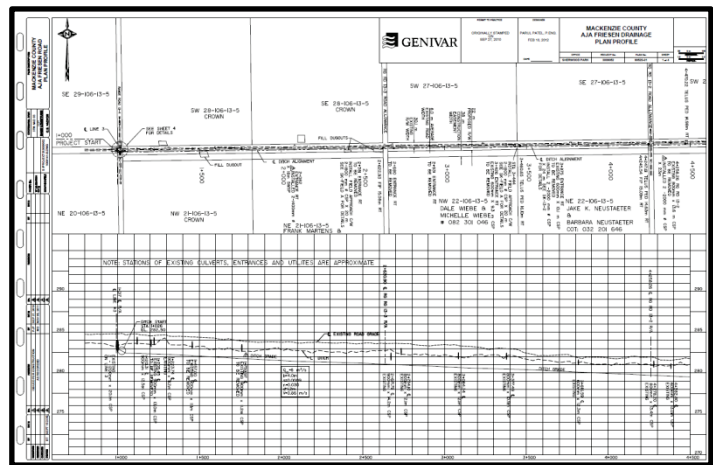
As constructed drawing for the AJA Friesen drainage ditch project
